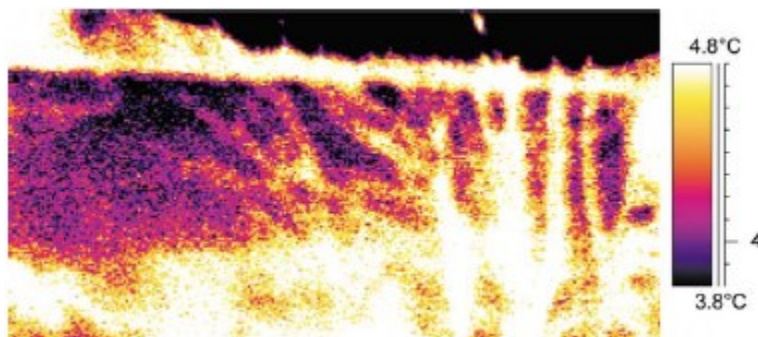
West side infrared of Kilbucho bridge (Clark et al. 2003).
